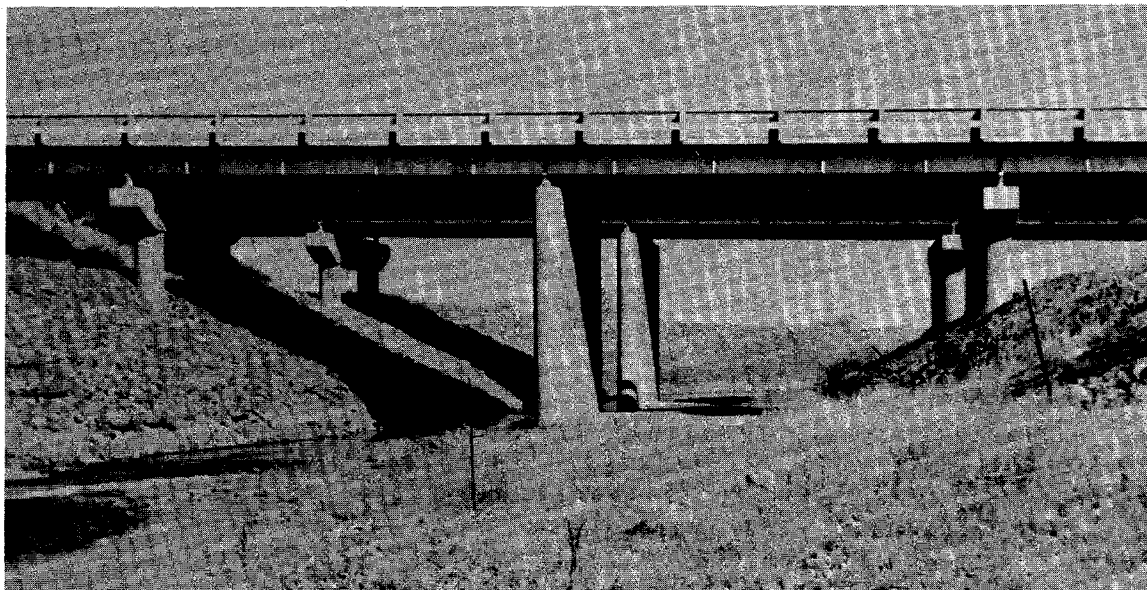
Downstream view of I-25 bridge on February 9, 1977, showing configuration of center piers as rebuilt after the flood, and protection of abutment fill slopes by rock-and-wire mattress.
